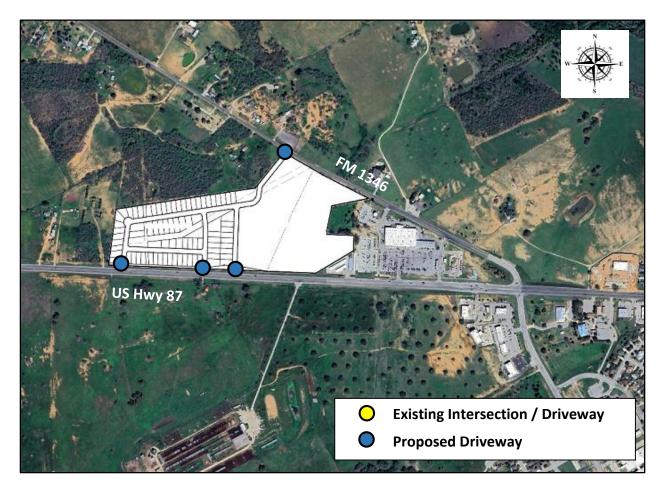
Existing and Proposed Access Driveways for the NP Homes
